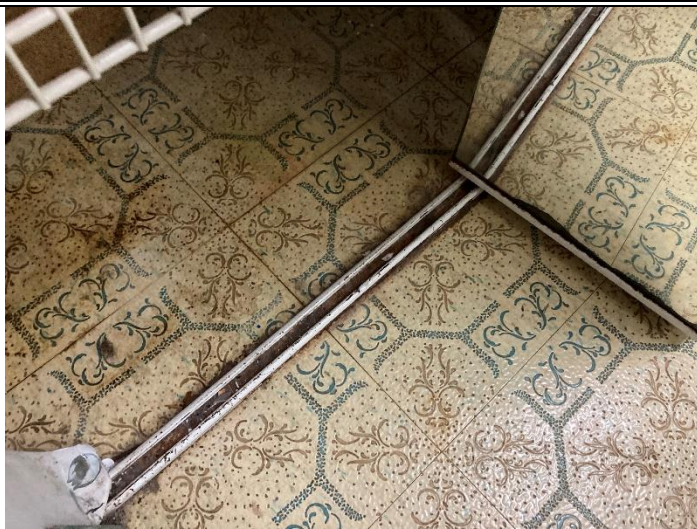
7760 HA C - 12" x 12" VCT Floor Tile, Multi
